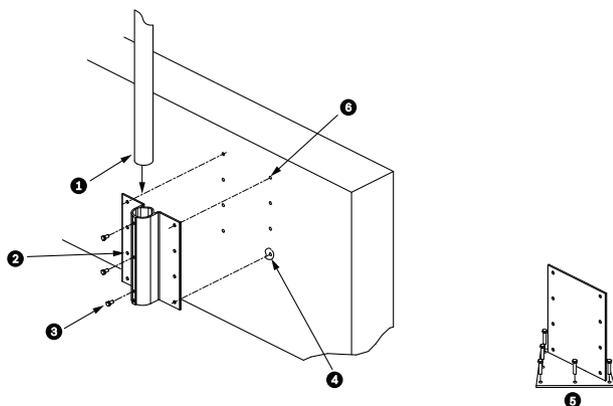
Parapet Wall Mount Bracket and Roof Mount Plate
